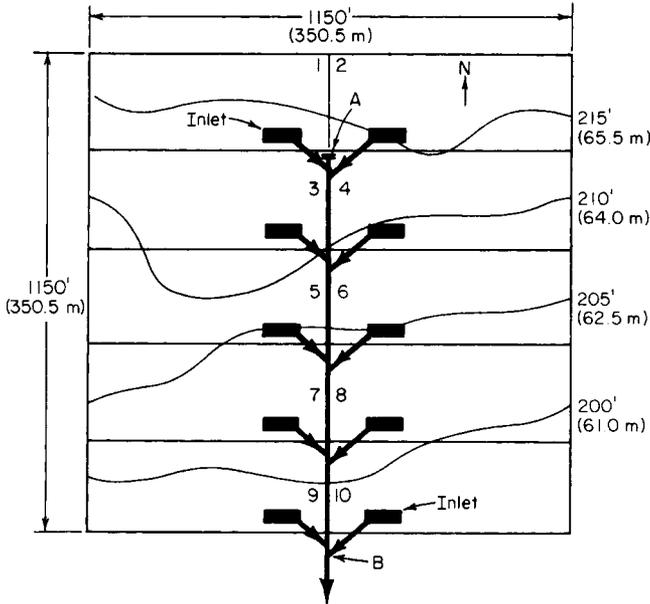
Typical storm-sewer plot plan and layout diagram.
